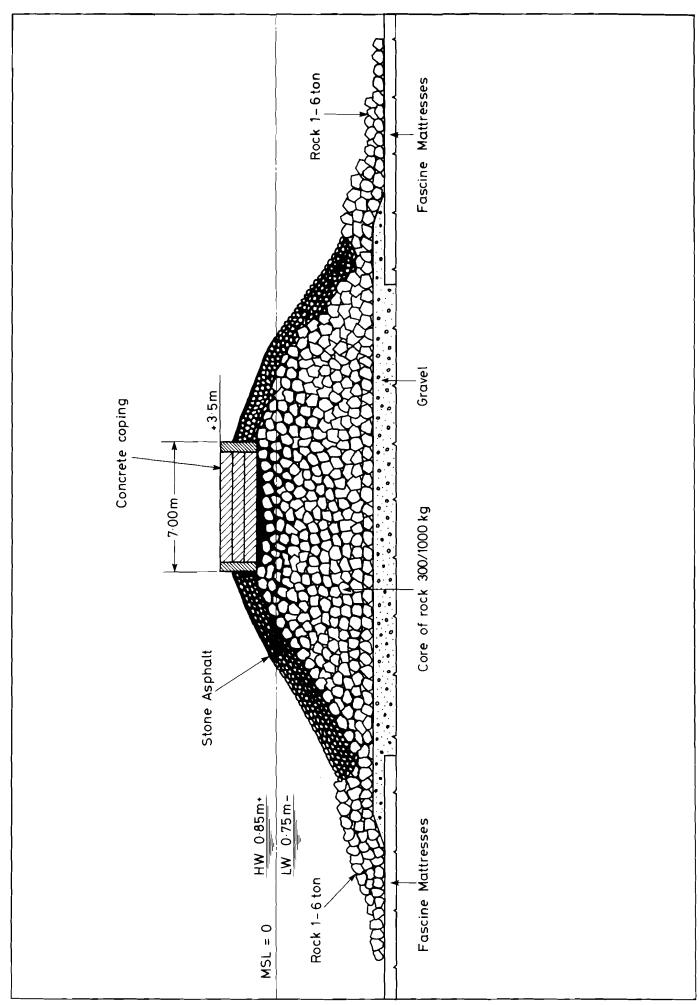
Ijmuiden Breakwater, Holland, built 1962–67
